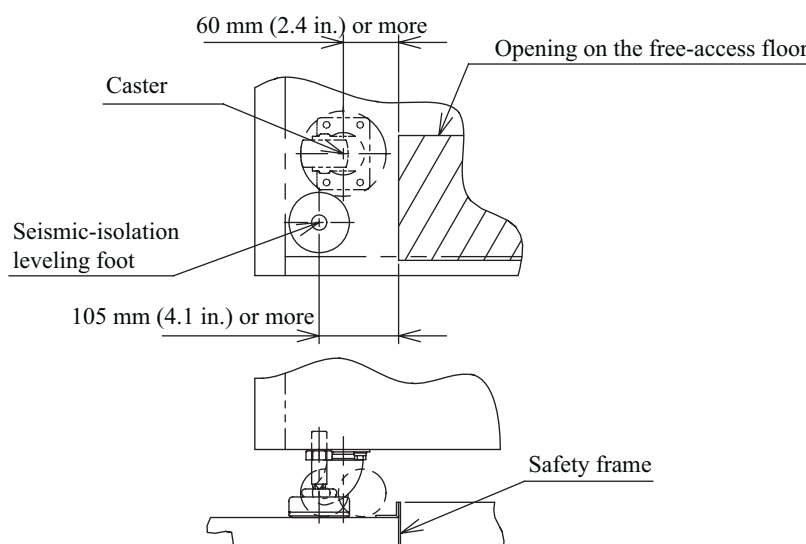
Opening on the free-access floor when a seismic-isolation leveling foot is used
